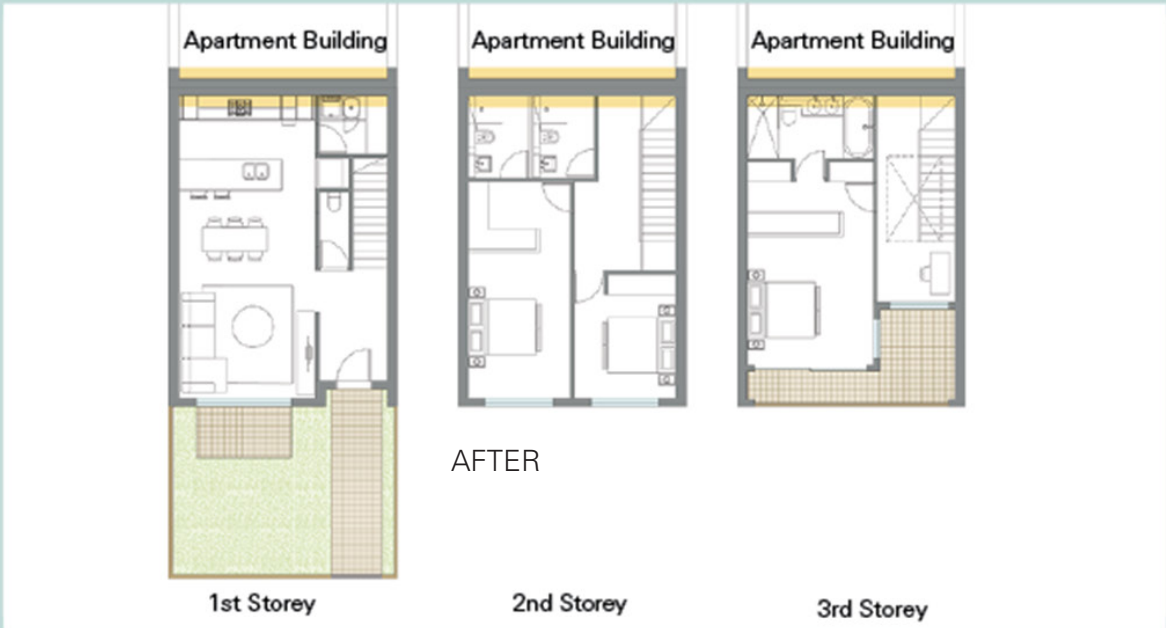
Potential Single Loaded Townhouse Apartment Layout
